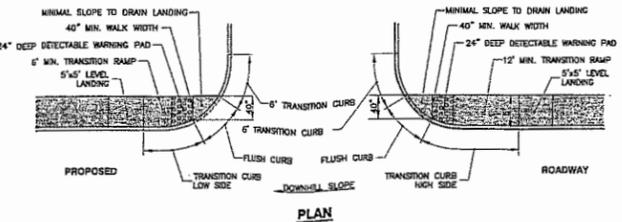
DETAIL OF DETECTABLE WARNING PANEL FOR WHEELCHAIR RAMPS
